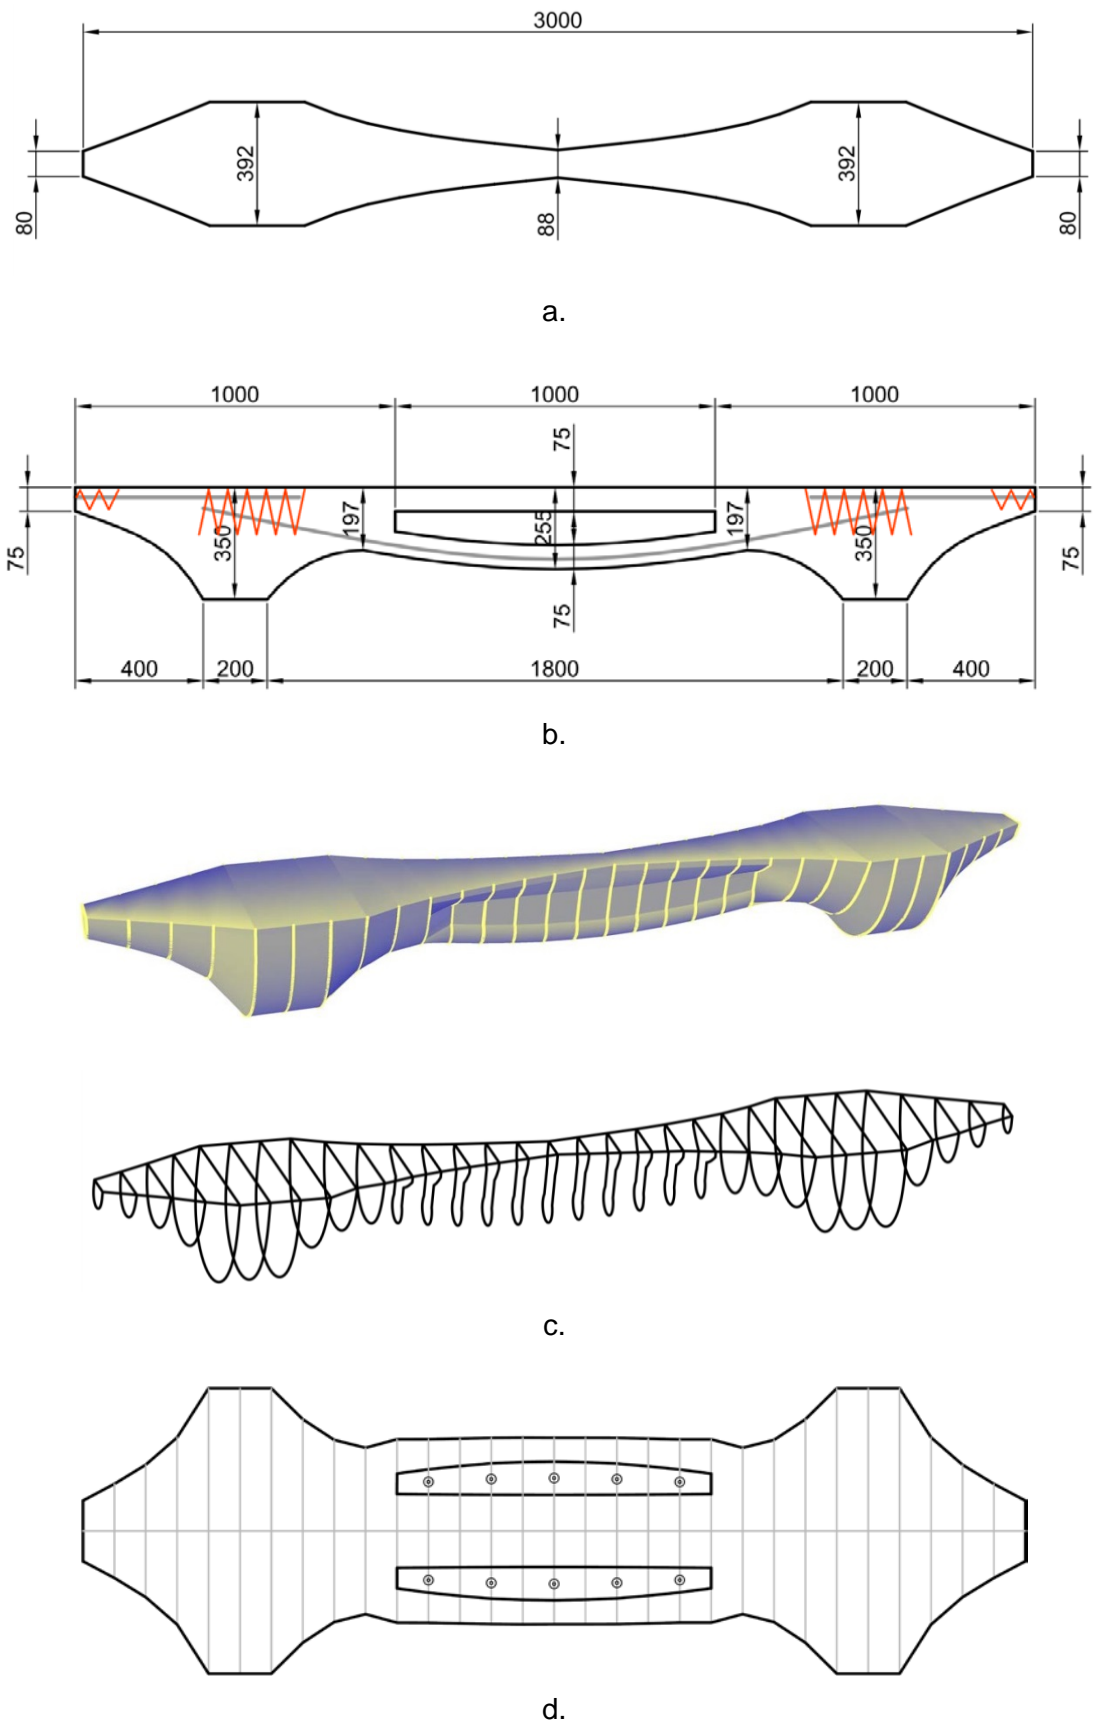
Case study 2 geometry details: (a) plan, (b) elevation, (c) 3-D view of cross sections and (d) fabric pattern (all dimensions are in millimetres)
